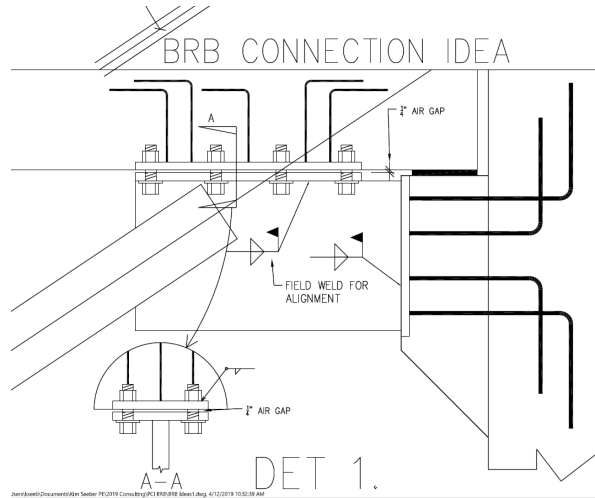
Connection with bolts in single shear, 1/4" air gap to prevent gravity load transfer
